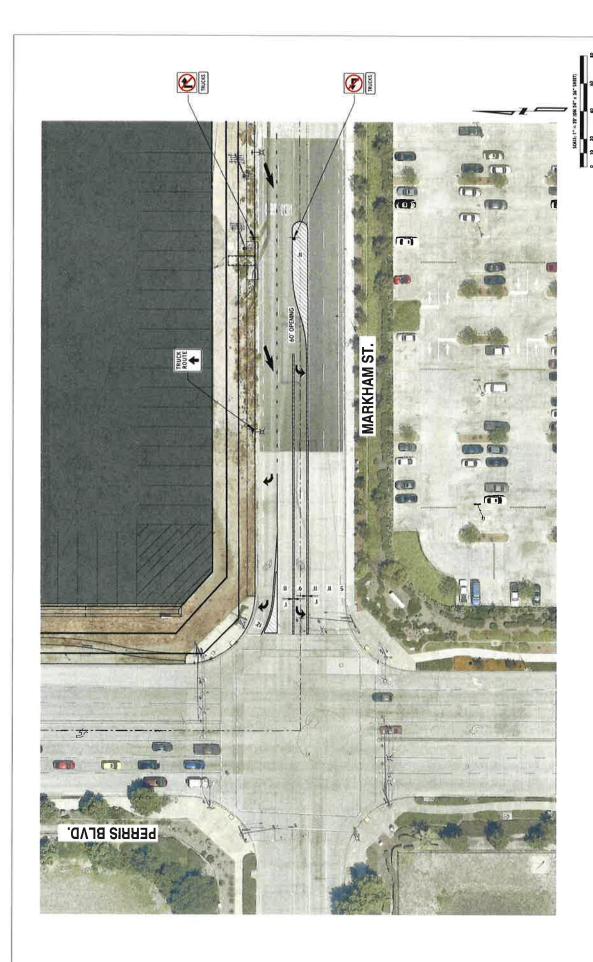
EXHIBIT A: PERRIS BOULEVARD @ MARKHAM STREET CONCEPT
